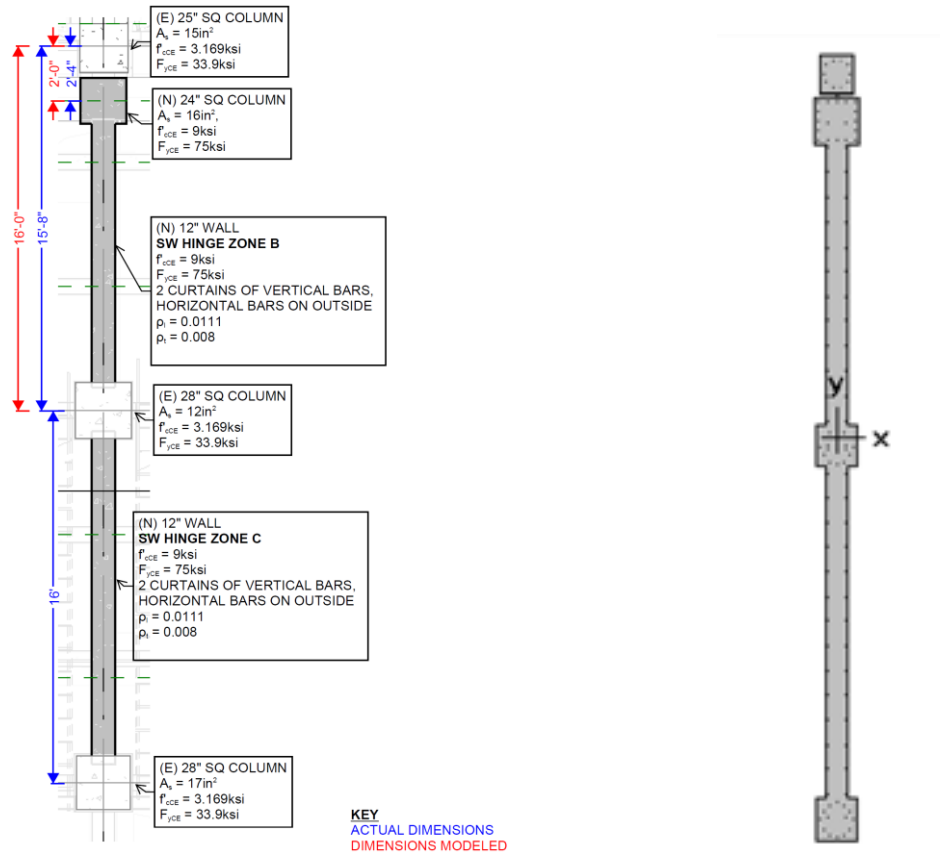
Elevations of transverse structural walls along grid lines 6 (left) and 8 (right).
